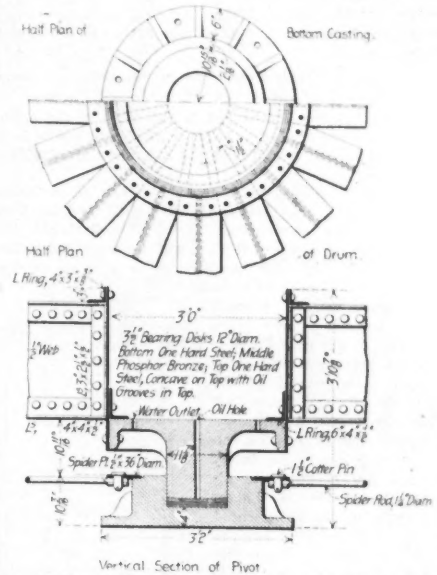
Turntable and Center Pivot Construction for Grand Trunk Ry. Bridge Over Trent Valley Canal.
